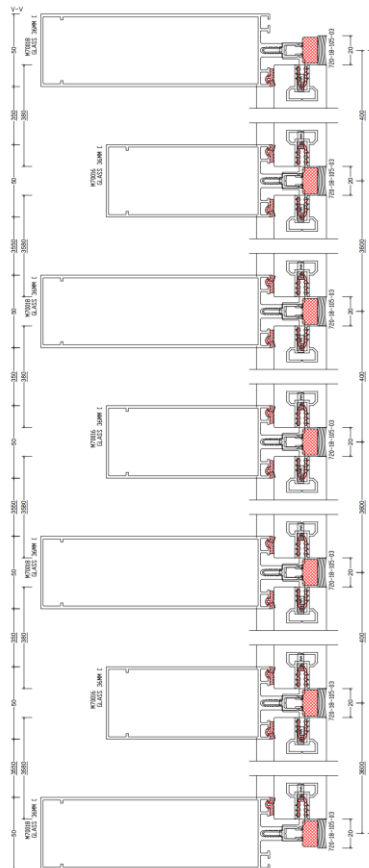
Section drawing detail of curtain wall used in 3D modelling (horizontal aluminum profiles).
